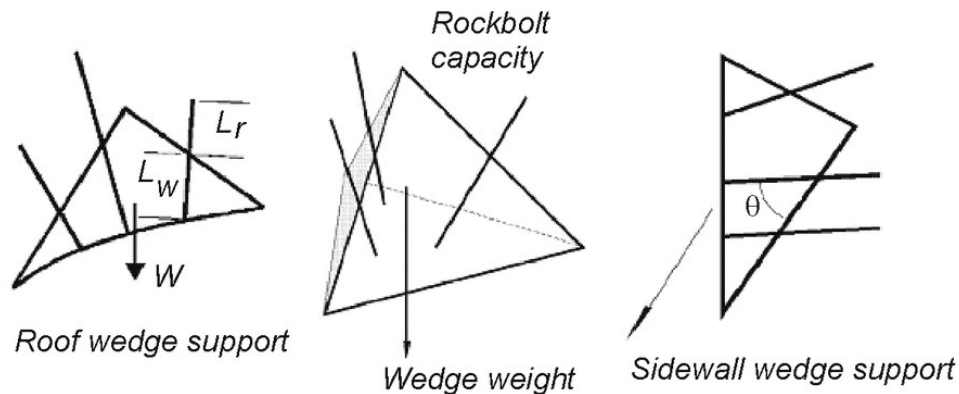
Rockbolt support mechanisms for wedges in the roof and sidewalls of tunnels
